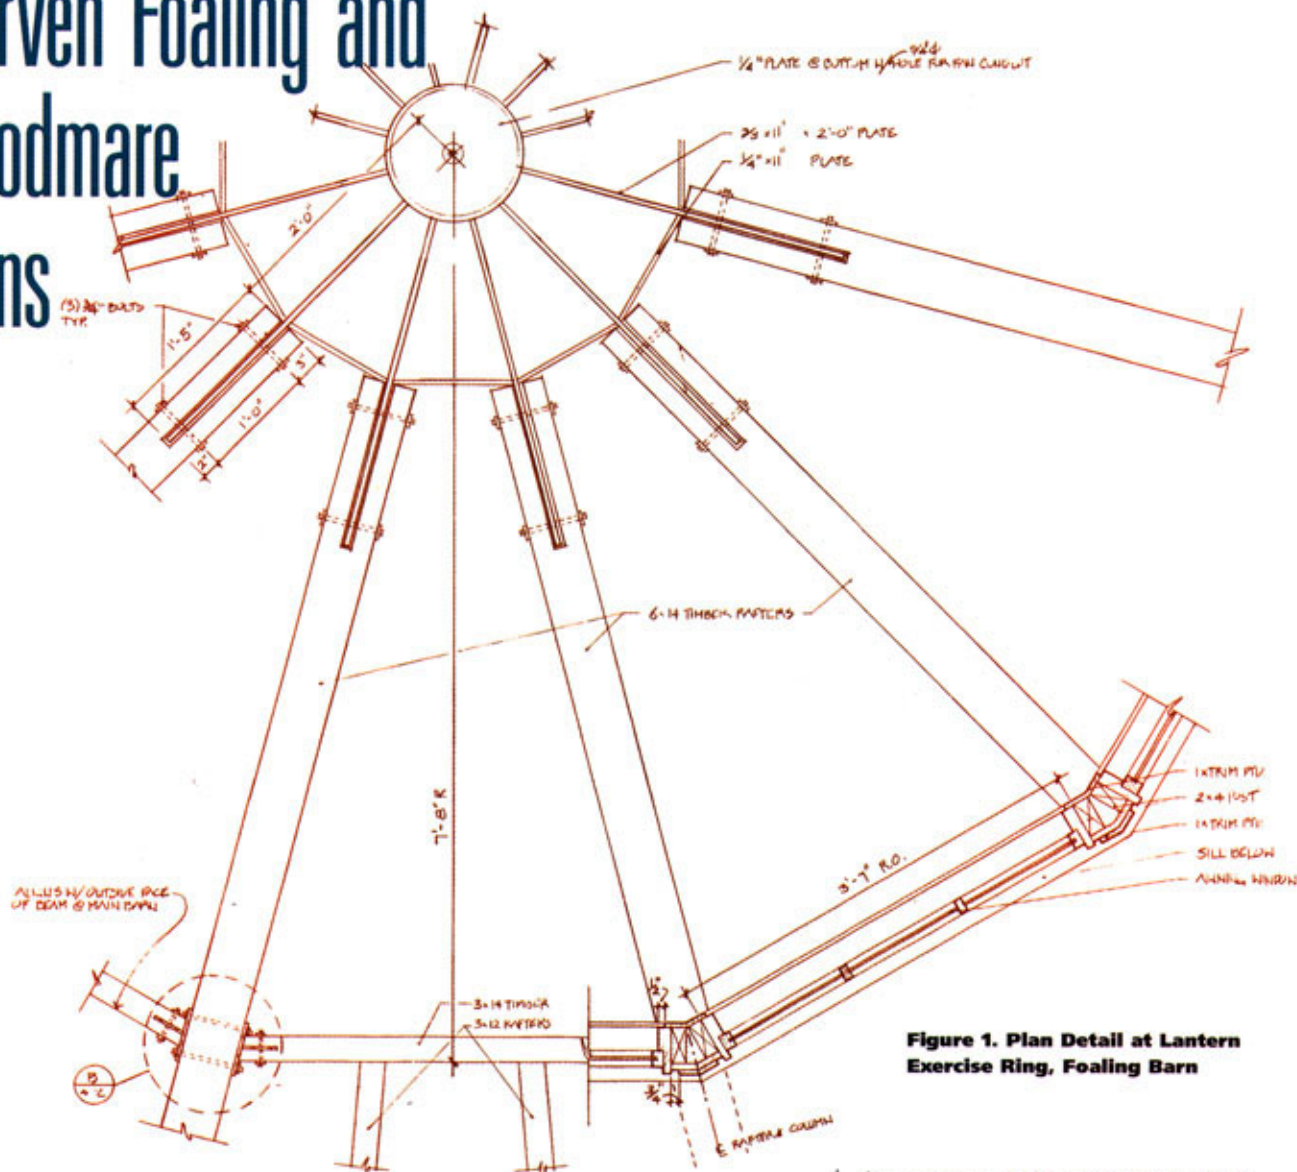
Plan Detail at Lantern Exercise Ring, Foaling Barn
